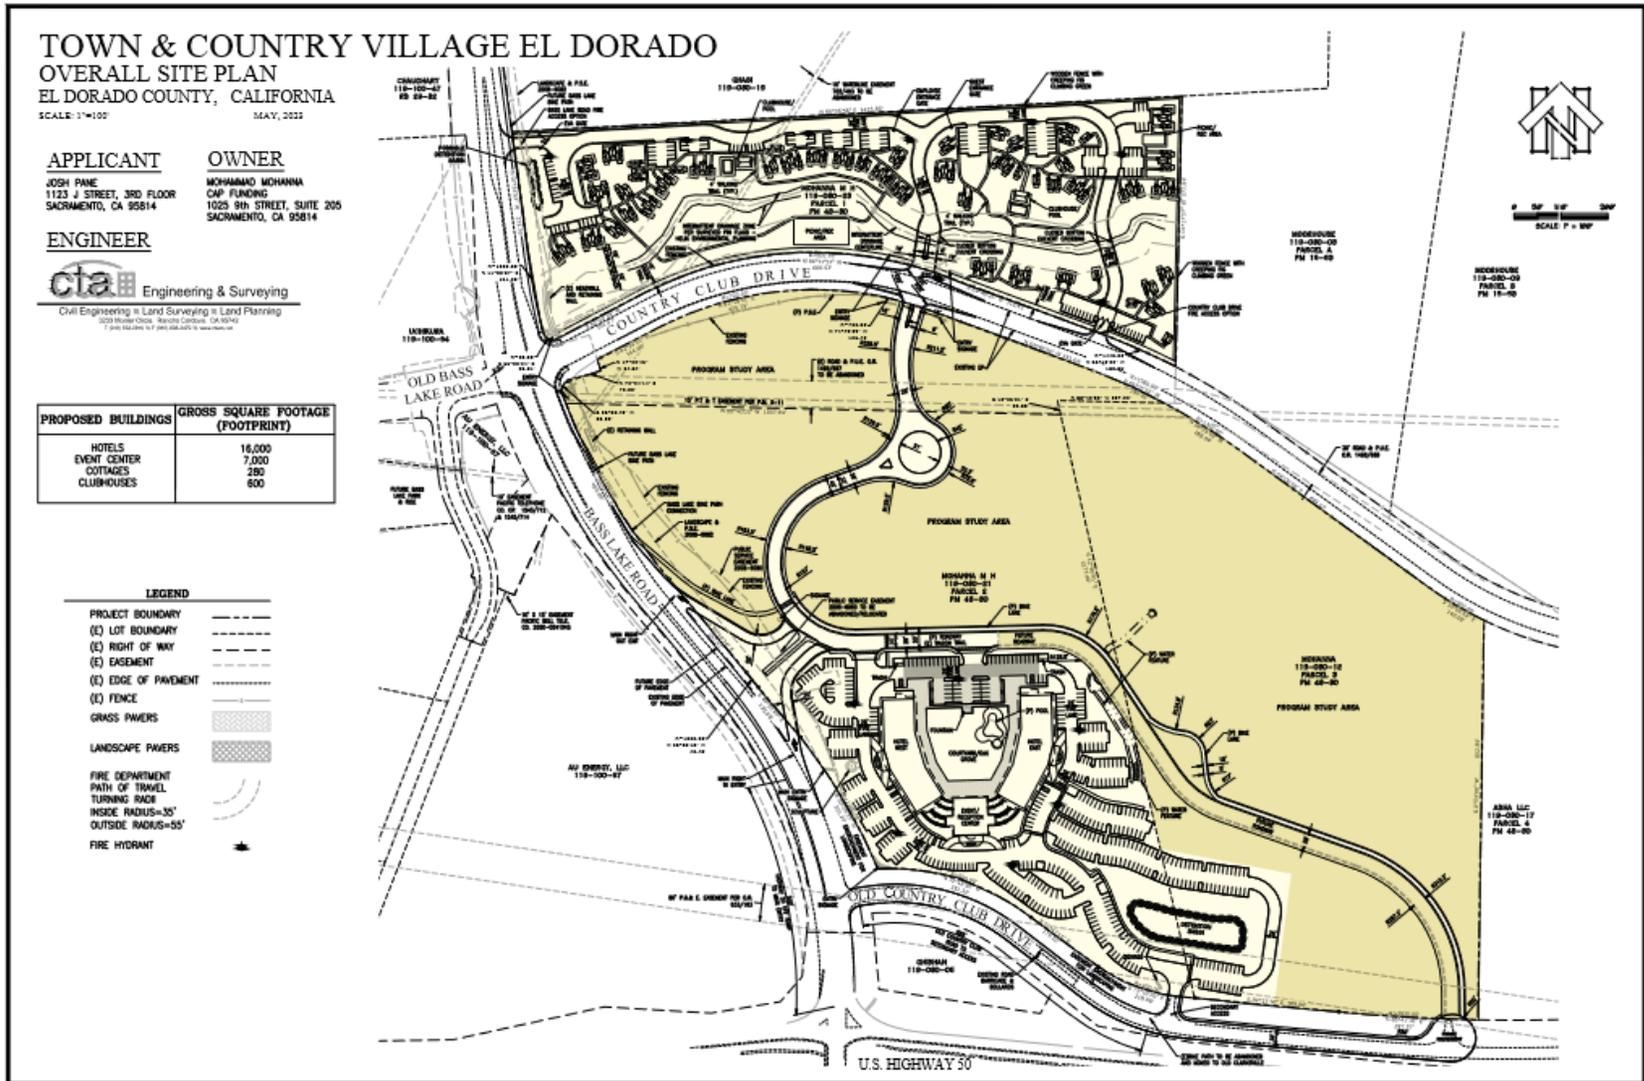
presents the overall site plan layout for the Project Development Area. Note that the Program Study Area (shaded darker tan) does not yet have a site plan specified, but may be developed in the future as part of the overall Proposed Project.
